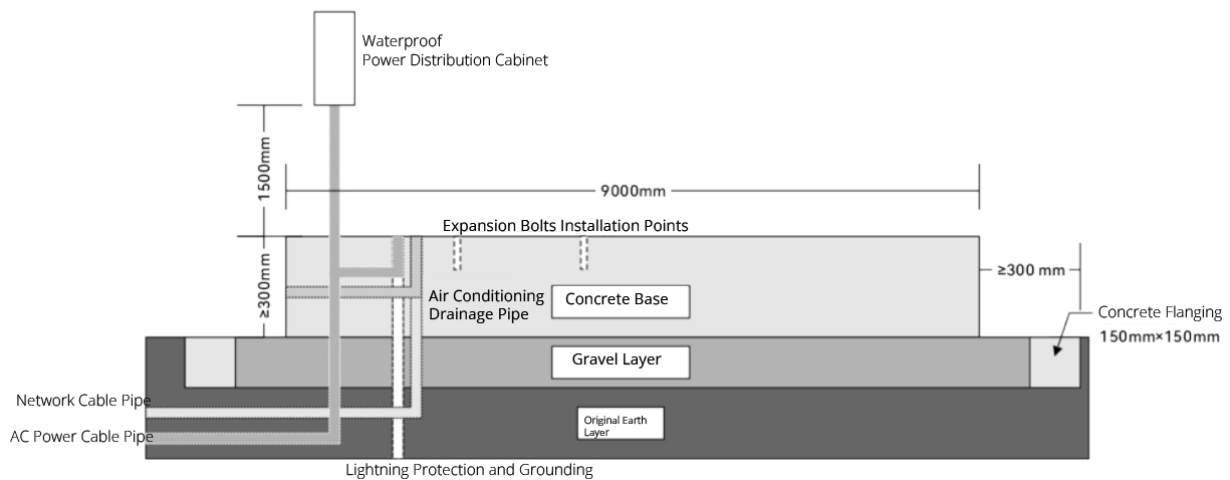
Non-Hardened Concrete Ground Construction Diagram
